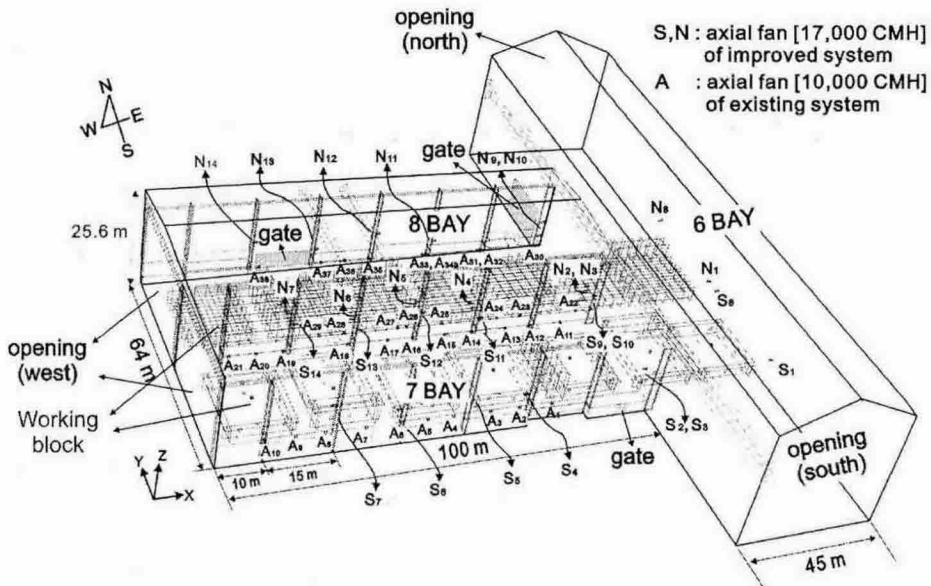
Schematic of a large welding factory in the present study.
